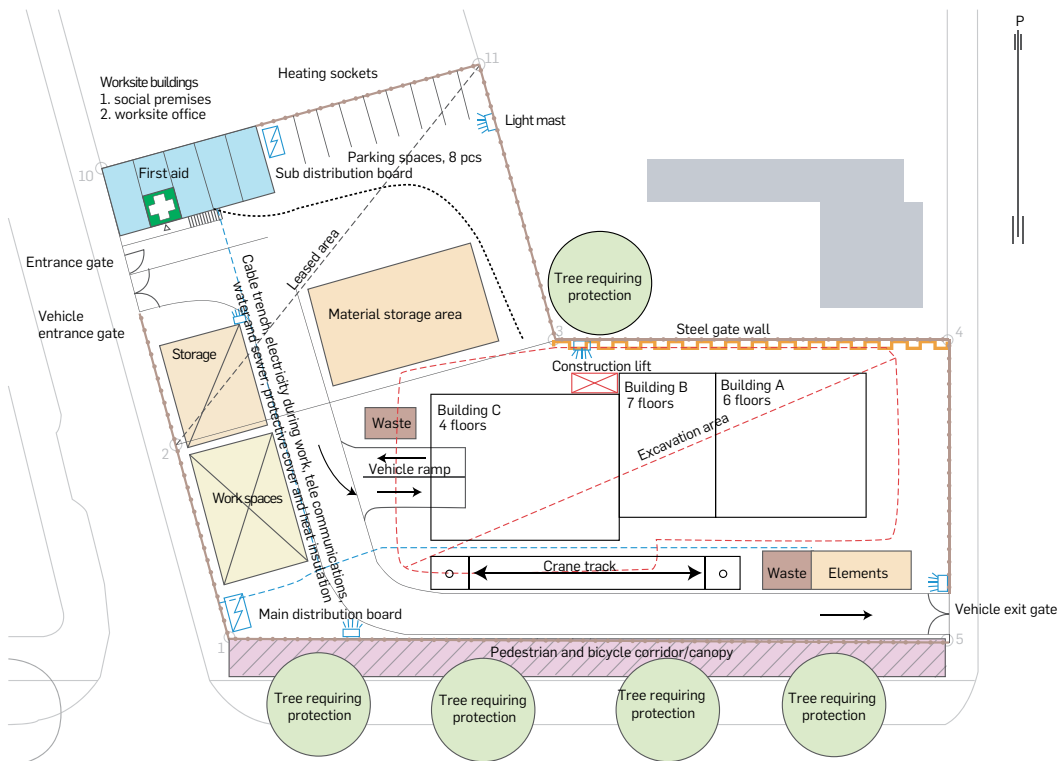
Example of a site layout plan in the framework construction phase. (Building Information Foundation 2007)
